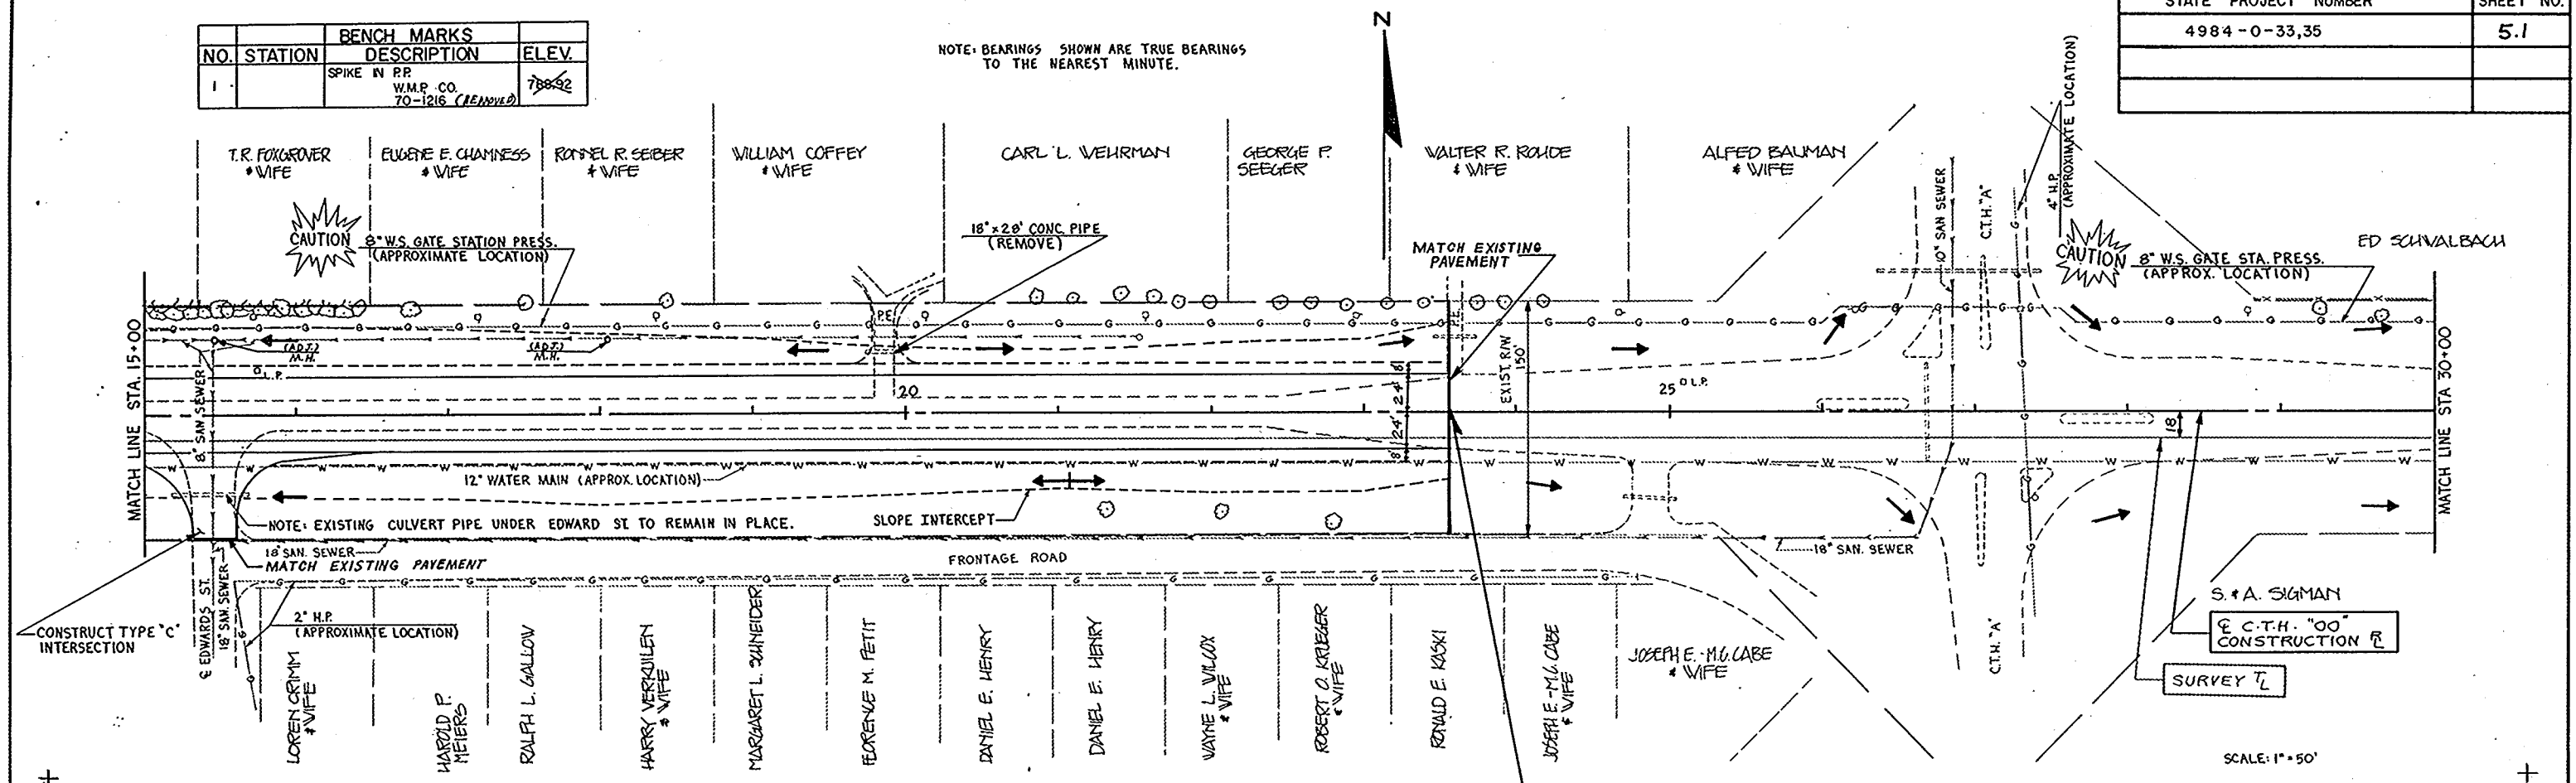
SINGLE PLAN AND PROFILE-FULL LINE
